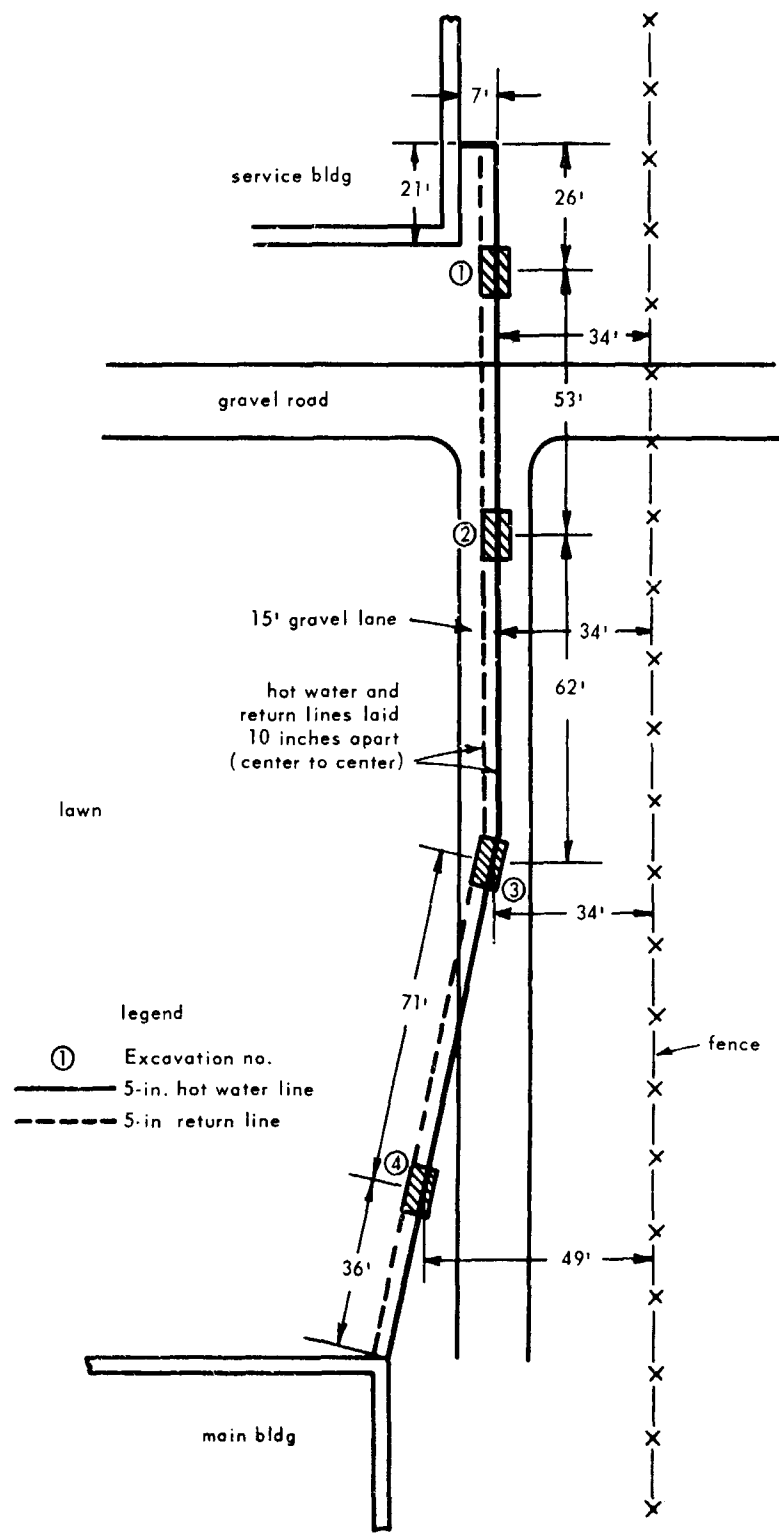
Plan view: location of underground hot water pipes, Lake City Sewage Plant, Municipality of Metropolitan Seattle, Washington.
